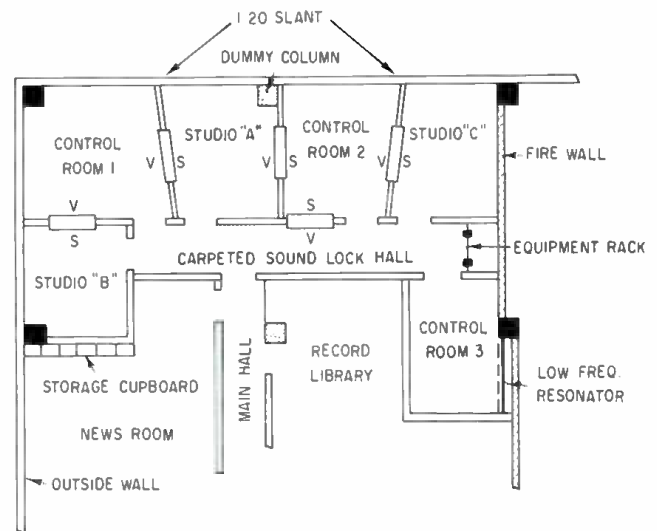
The final studio floor plan decided upon. Note the deliberately angled walls.
